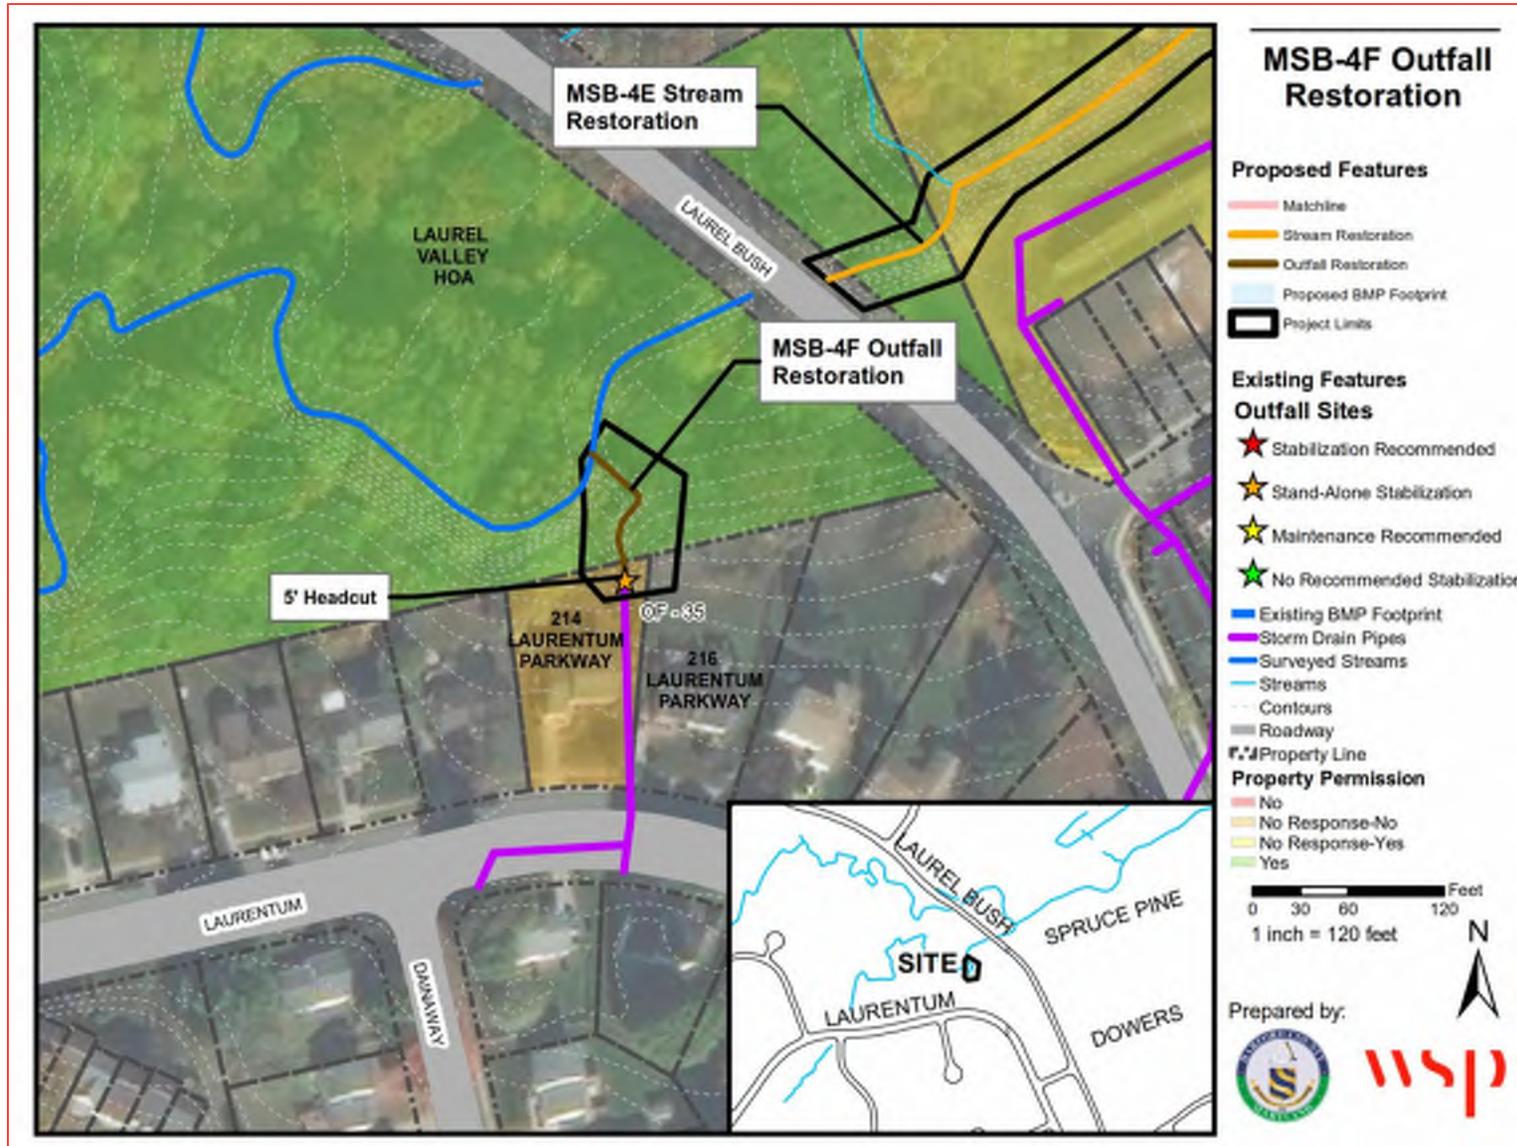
Site Location and Proposed Project Plan for MSB-4F Outfall Restoration
